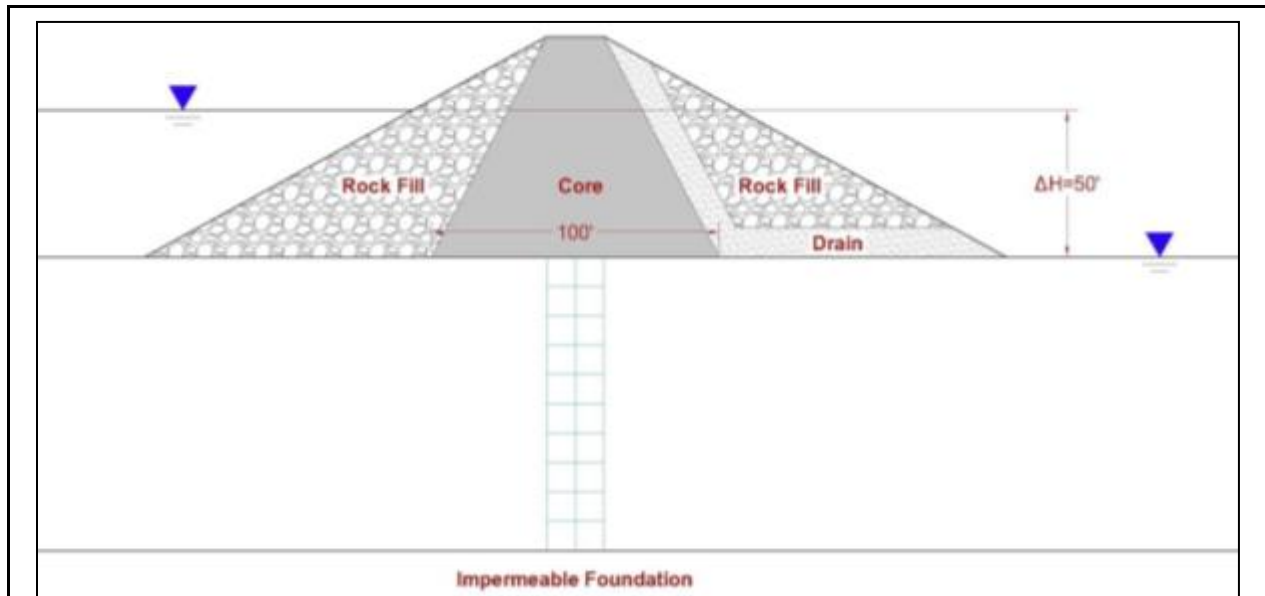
Example of flow net construction and calculations for a section with a foundation with a fully penetrating grouted barrier.
